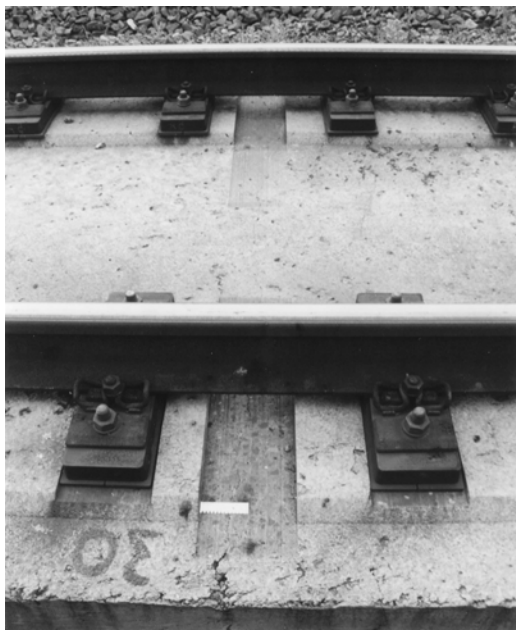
Ballastless track with discrete rail seats on a JRCP. Exact support of the fastening systems had been provided by grinding of the concrete pavement. Test section near Waghäusel.
